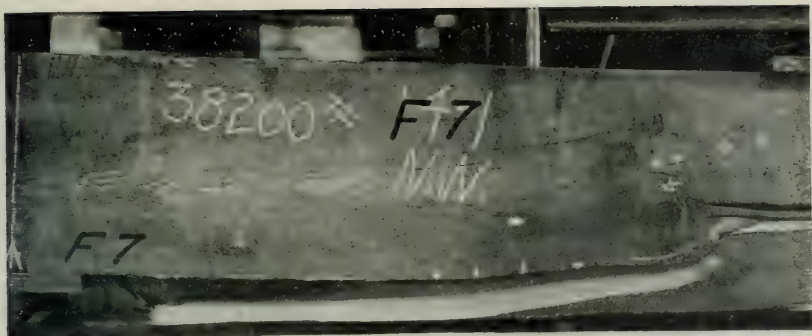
VIEWS OF BEAMS AFTER FAILURE.
